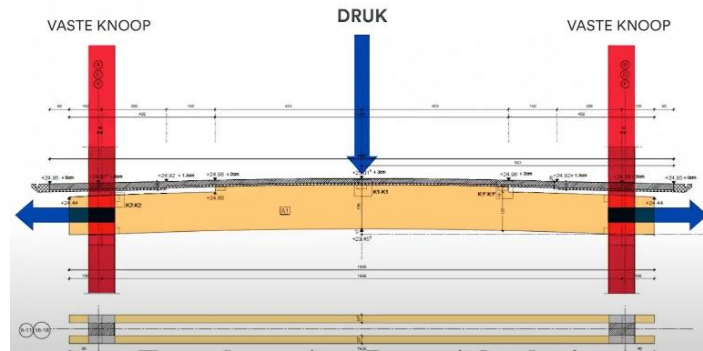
Cross-section beam plus floor (*Oosterweel Verbinding: Hout En Beton Op Park & Ride [Powerpoint-Slides], n.d.*)
